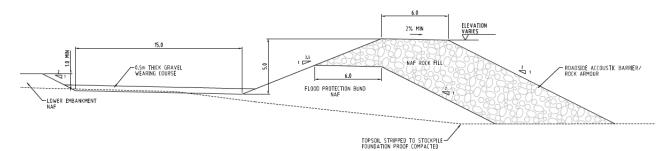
Typical cross section of the haul road and flood protection bund/roadside acoustic barrier.
